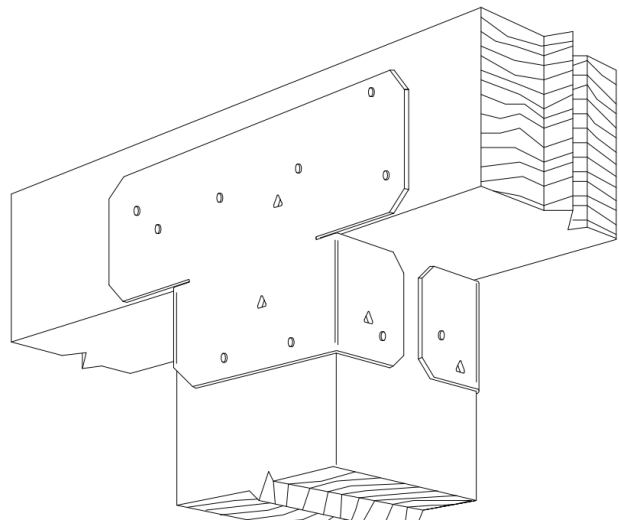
Conceptual retrofit detail for connecting wood posts to the wood floor beams within the crawl space.
